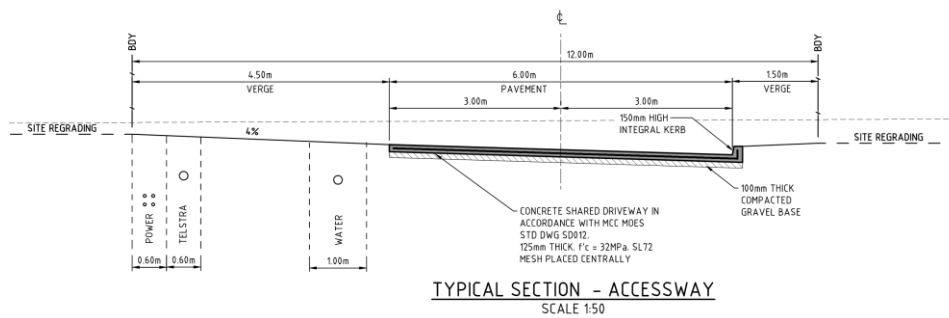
Proposed Typical Cross Section of the Accessway (Source: GCA Engineering Solutions, Note: NOT TO SCALE in this Report)
